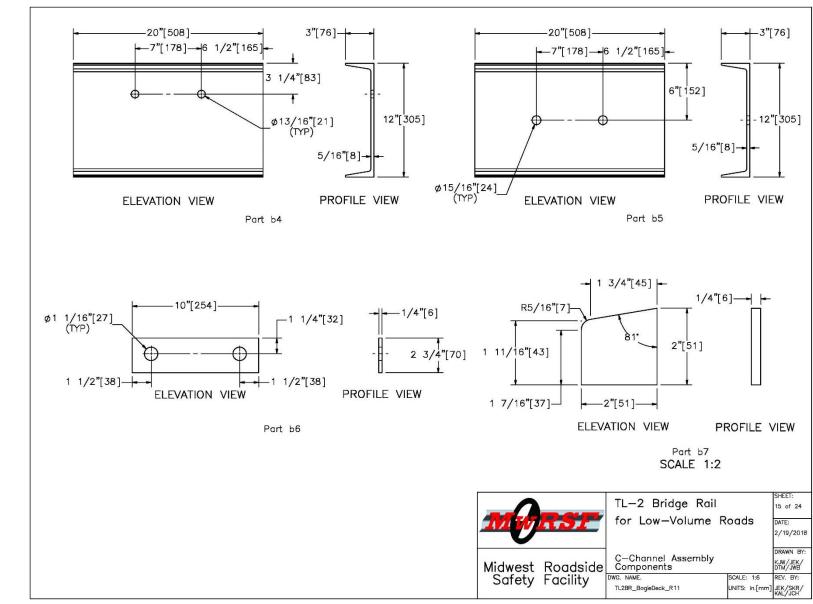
Bogie Testing Matrix and Setup, C-Channel Assembly Components
